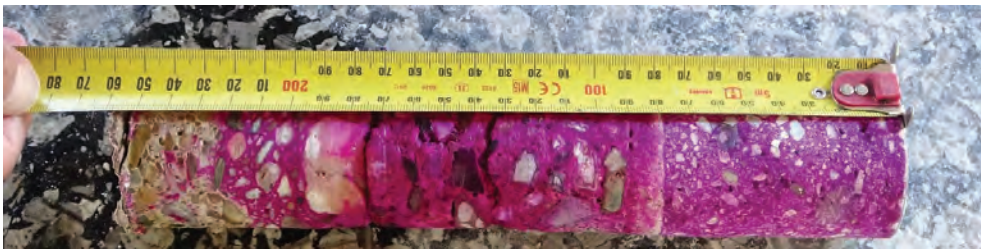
Core C4 with tape measuring from top of slab to soffit – Note topping slab, then balcony grout topping then original slab which also has a rendered and painted soffit.
